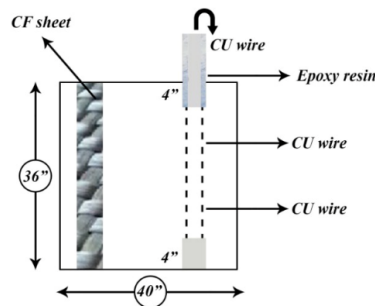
illustrates the arrangement and size of the reinforced concrete samples located near the sea ready-made box
